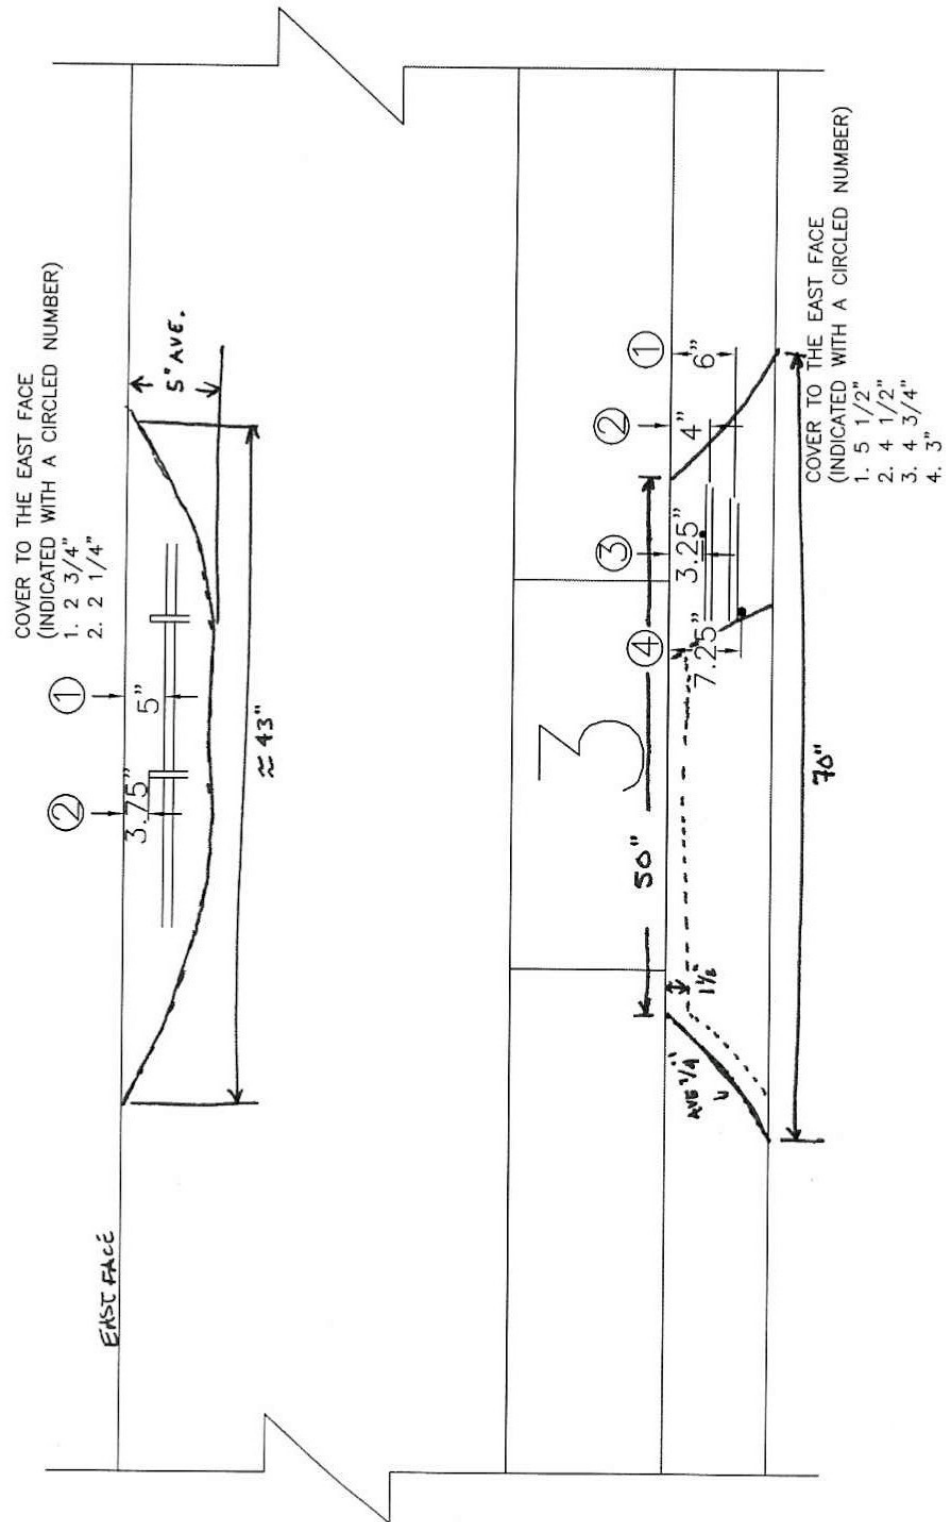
Concrete Damage – Back-side of Rail at Post No. 3, Test ACBR-1
